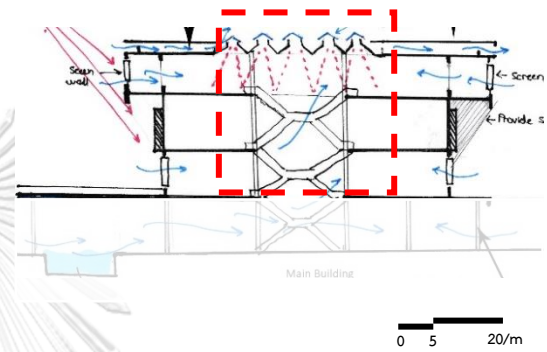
46 The First floor of the main building hall (source: A+U Magazine)
